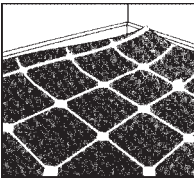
The sheet to be installed should be cut 3" oversize to allow for wall irregularities. The excess material is lapped up the walls.
